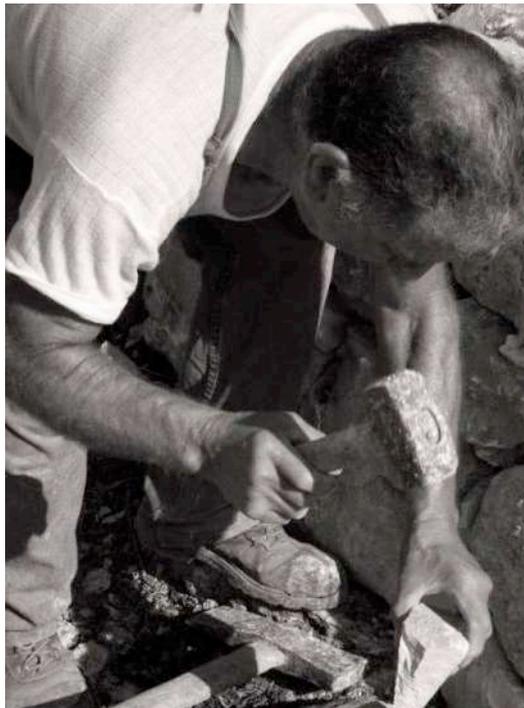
,3,4 - Paolo Zaffarana, construction of a drywall. Source: Archive Giuseppe Bertucci.
